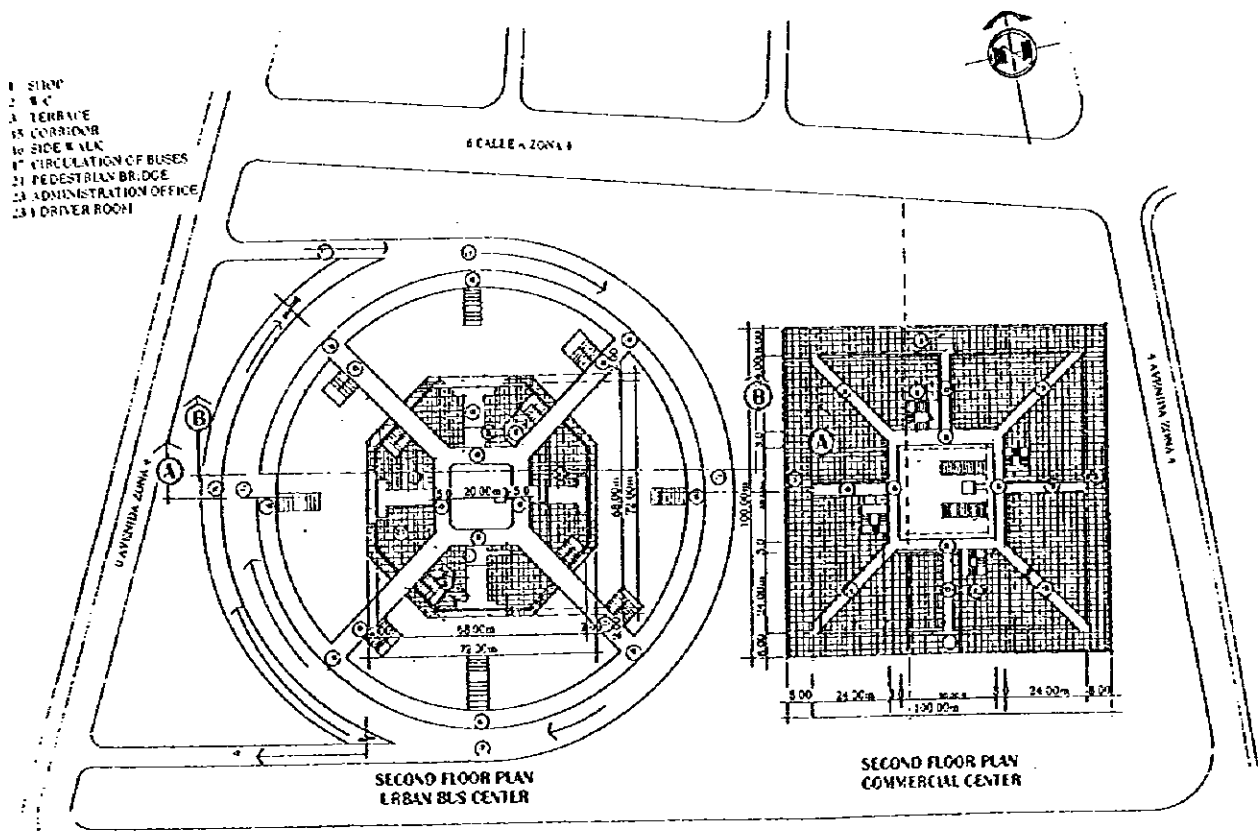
Second Floor Plan of Urban Bus Center and Commercial Center
